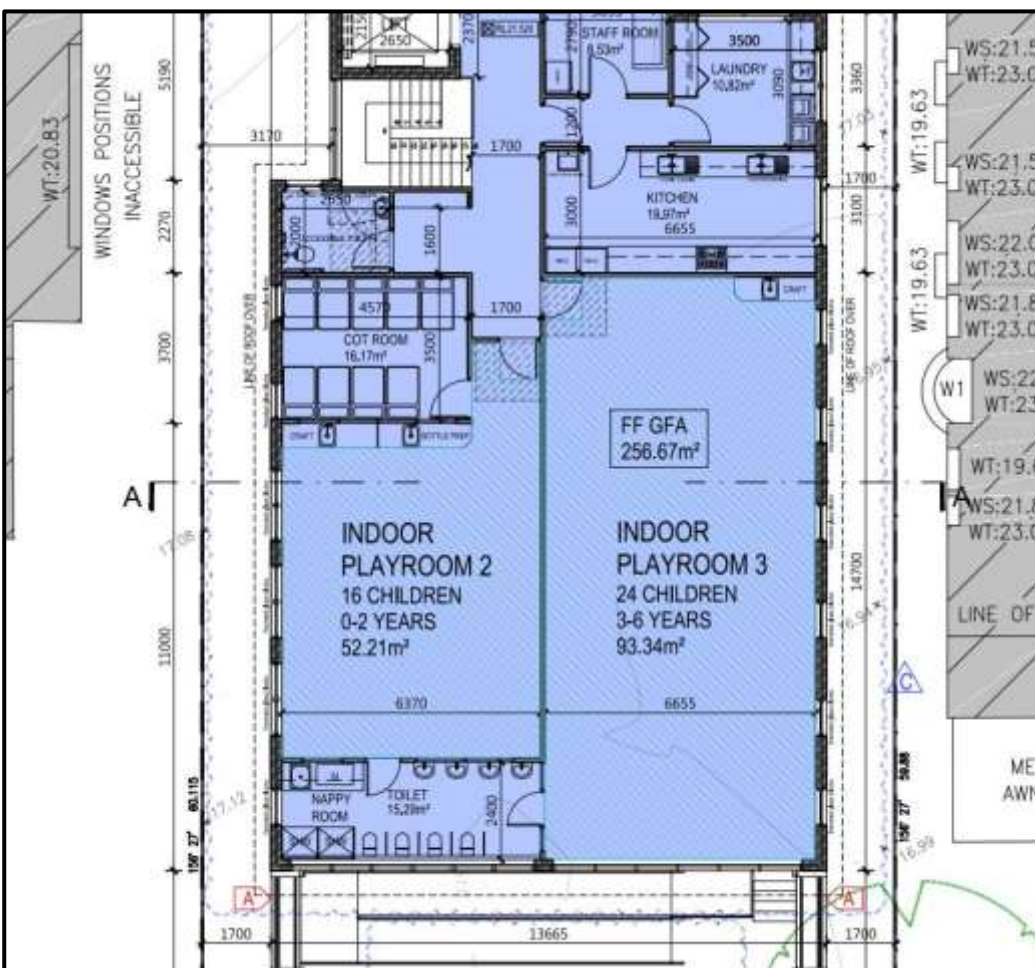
Approved layout of first floor – indoor playroom 2 and indoor playroom 3
